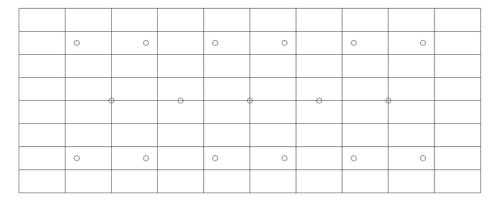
shows the redesigned systems lighting layout. A total of 17 luminaires are provided at a maximum spacing of 6 feet.
